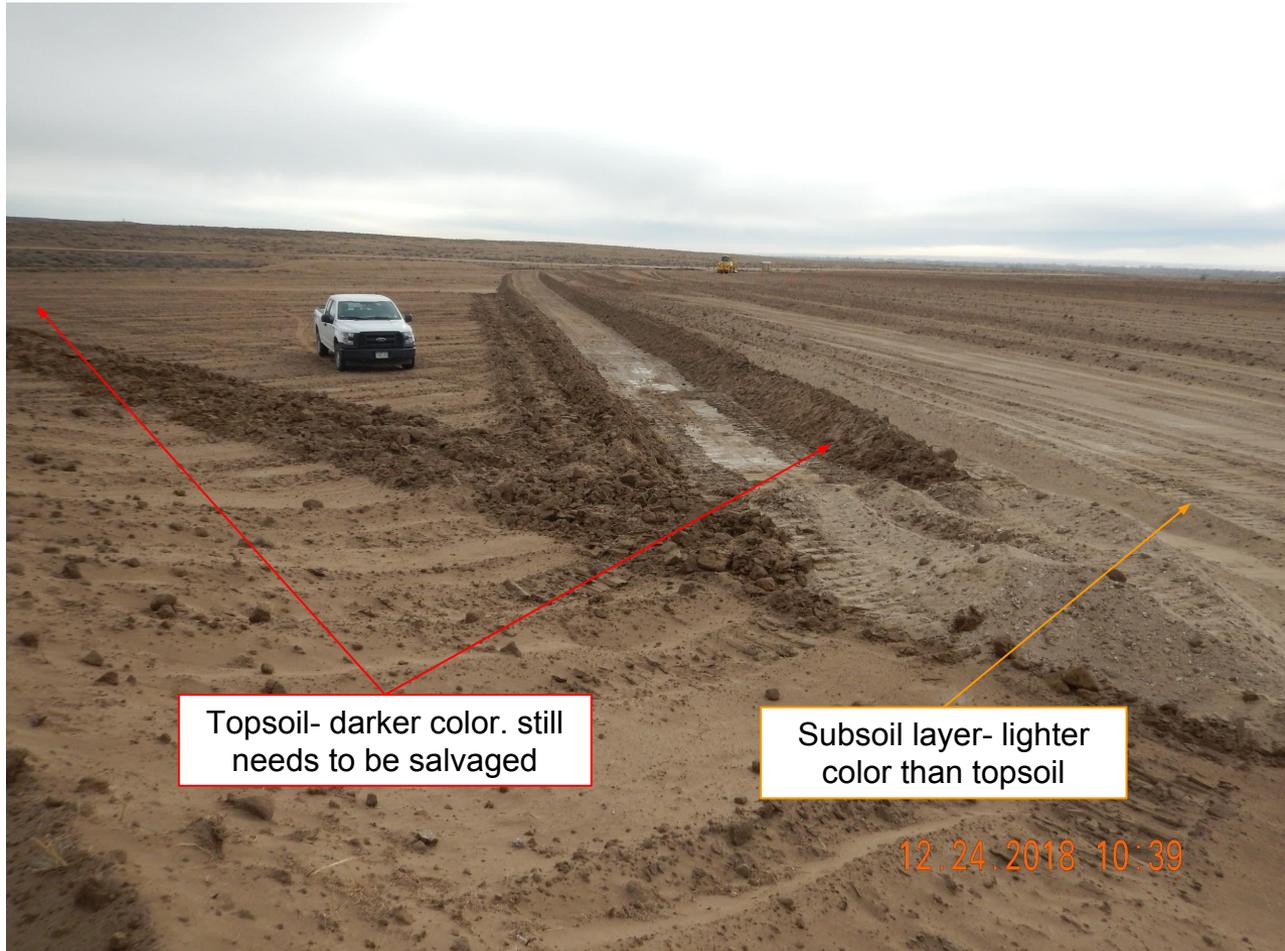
Photo taken from the northwestern topsoil stockpile, facing Southeast. Photo further demonstrates topsoil that still needs to be salvaged and the subsoil layer.
